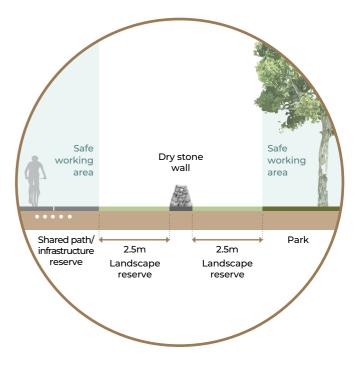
A distance of at least 2.5m between dry stone walls and underground infrastructure minimises safety risks during any works.
